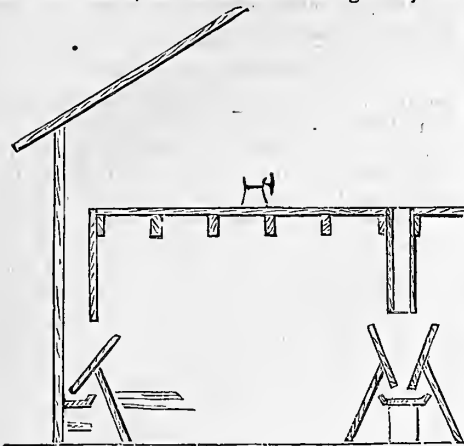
ARRANGEMENT OF FEED RACKS.
